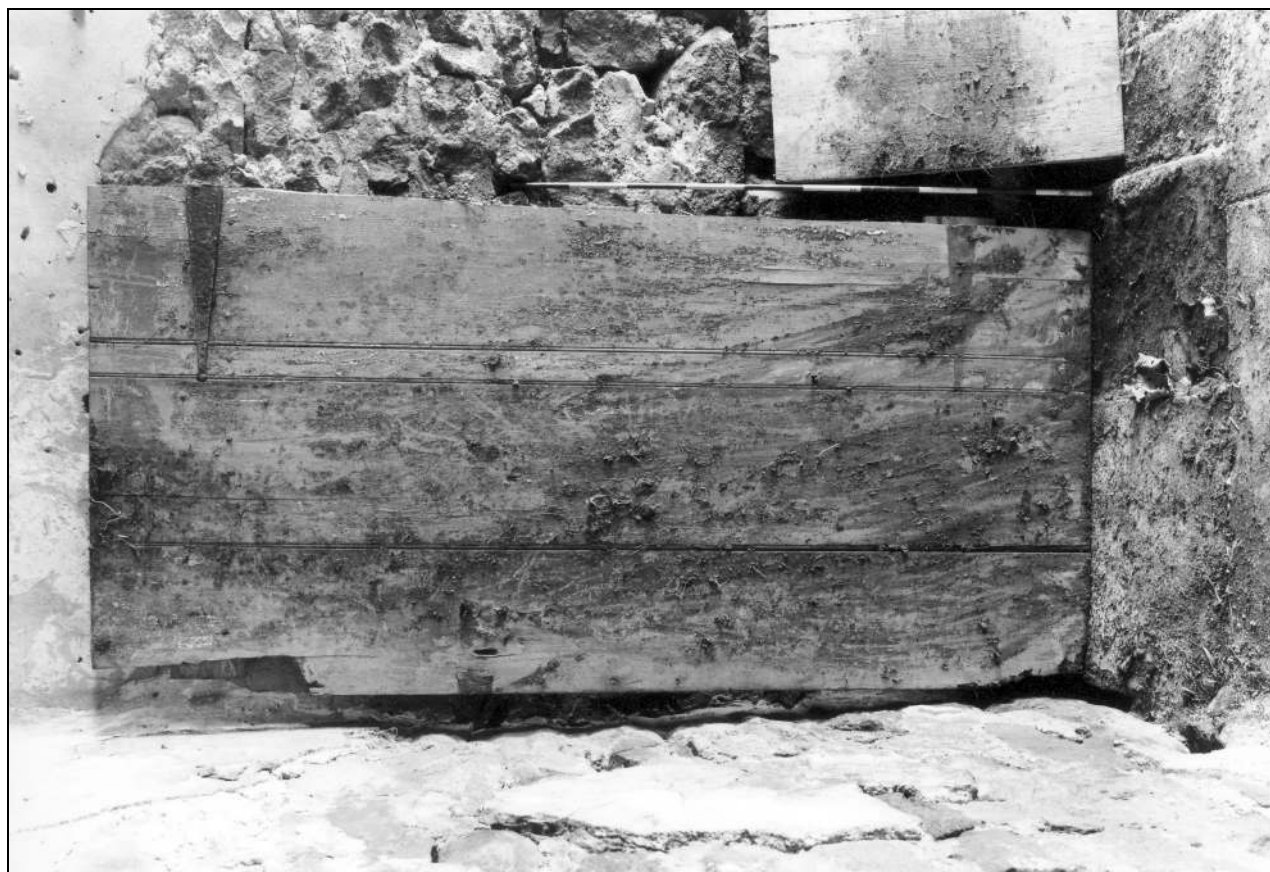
Detail of detached door in housebody (film 1, frame 17)
